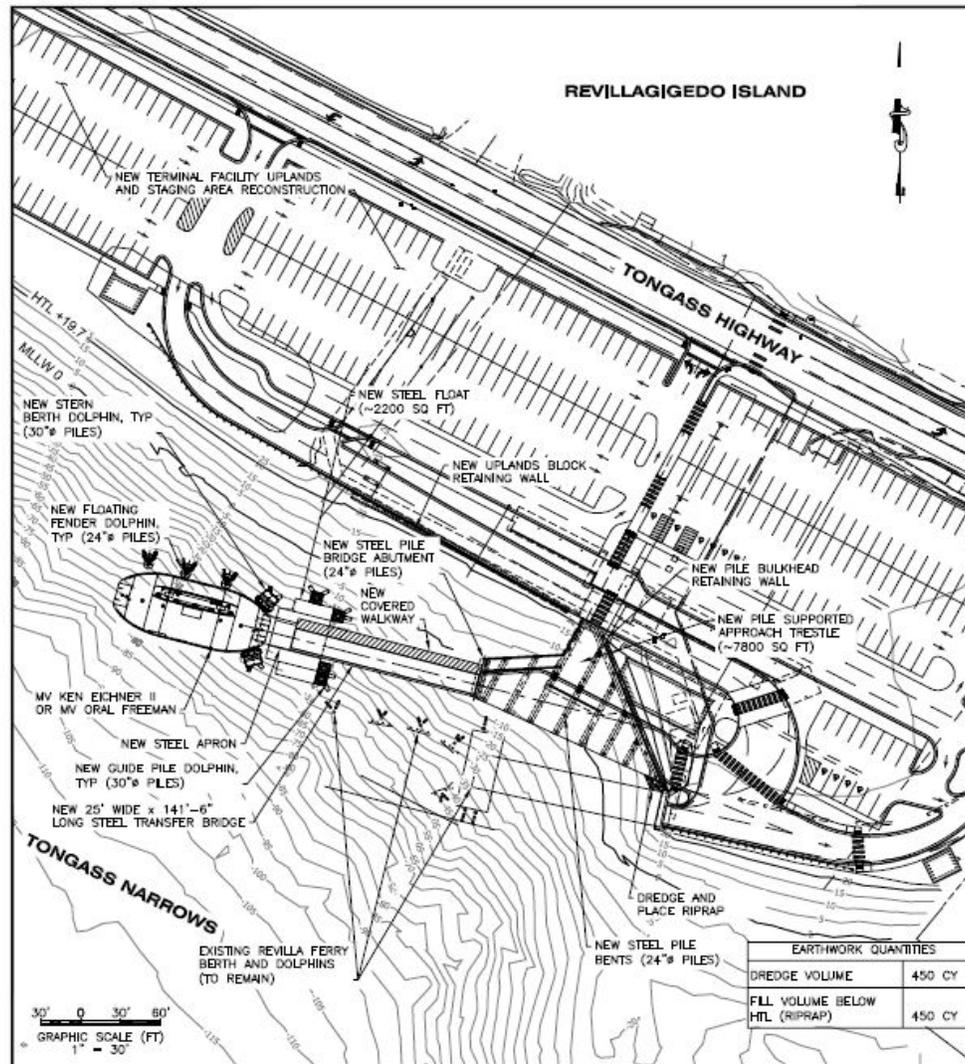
Site plan for the proposed new Revillagigedo Island Shuttle Ferry Berth (Phase 1, Component 1)(HDR 2018b).
